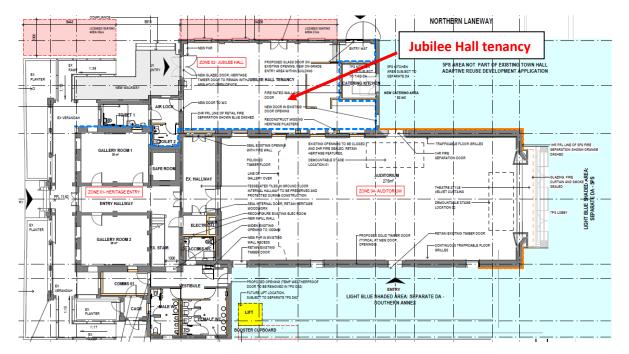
Location of Jubilee Hall, proposed food and drink premises (Source: Architectural Drawing No. AR-DA1-1100, Rev C)
